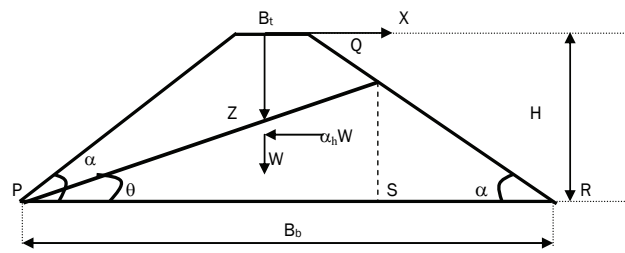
A Typical Trapezoidal Section of an Earth Dam with its Failure Plane
